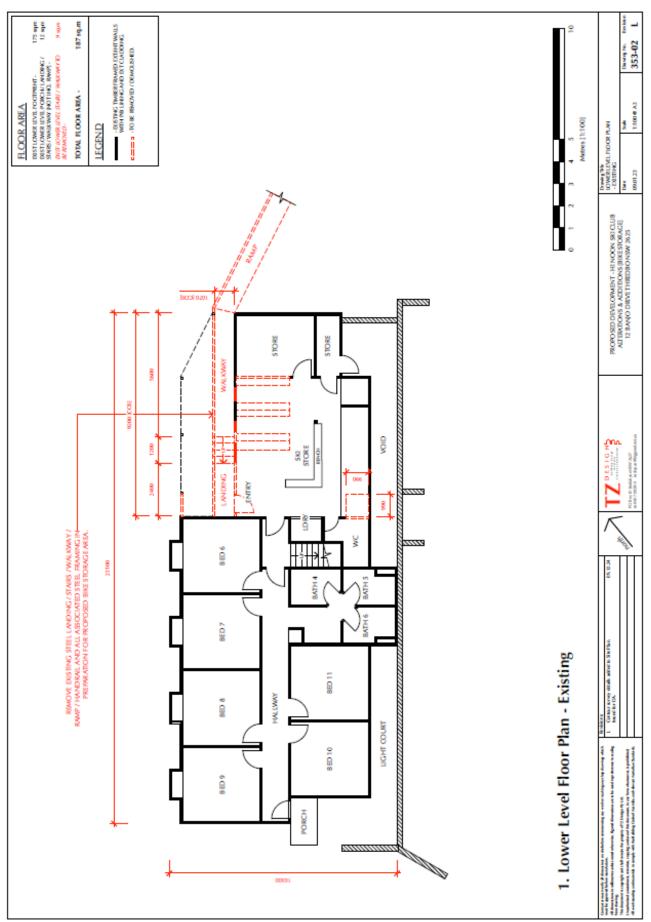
Lower Level Floor Plan - Existing (Source: TZ Designs, January 2025)
